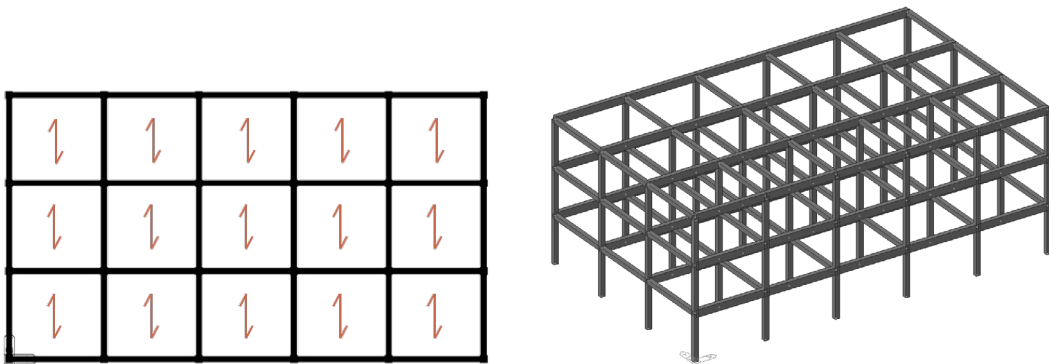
Floor layout of the RC structures a) and 3D view of the 3-story building case b).
